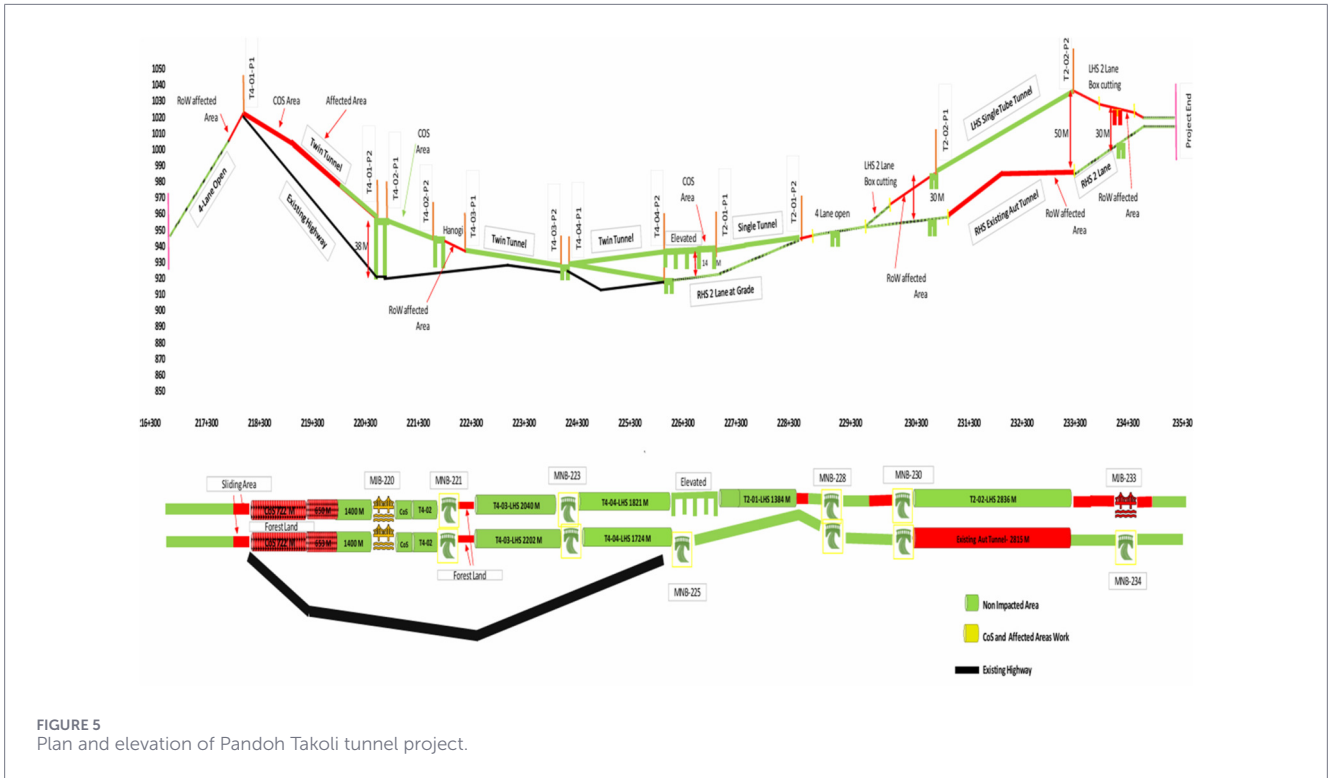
Plan and elevation of Pandoh Takoli tunnel project.
